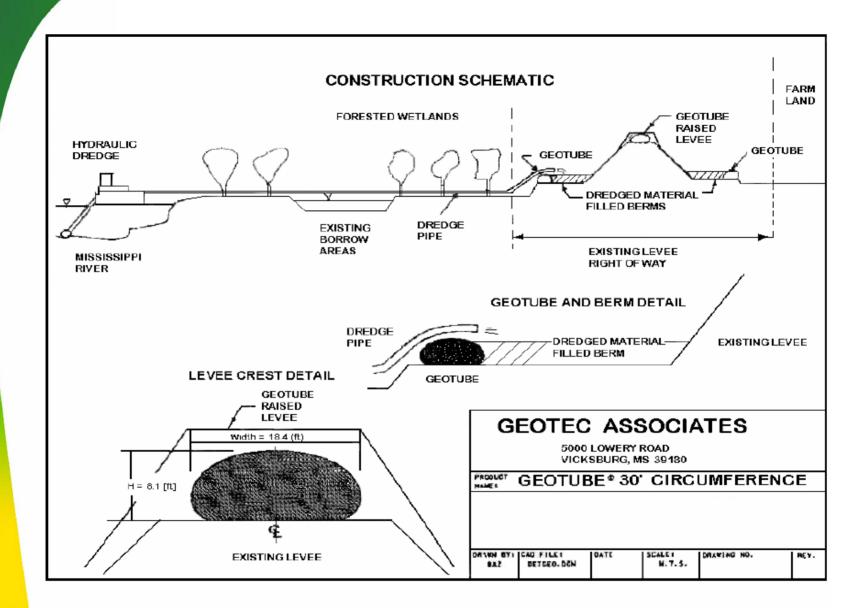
Profile View of Proposed Construction Schematic and Details for Dredge Filled Geotube<sup>TM</sup> and Berms for Raising Mississippi Levees
